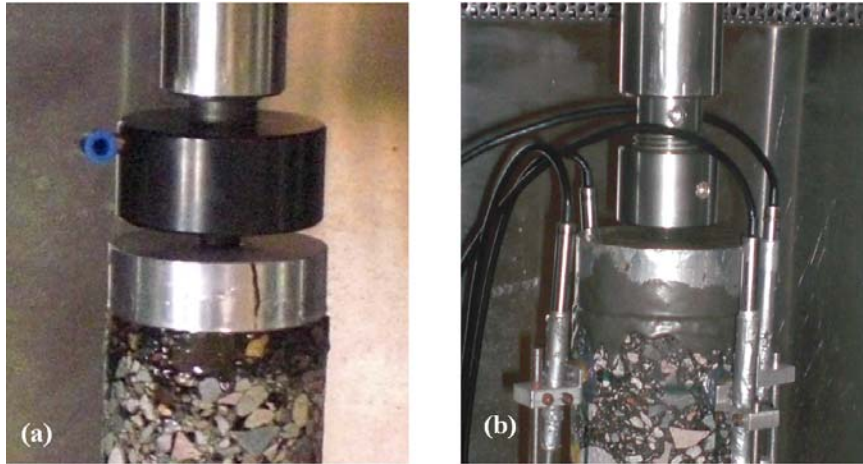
Locking joints: a) air-vacuum locked joint; b) thread locked joint.
